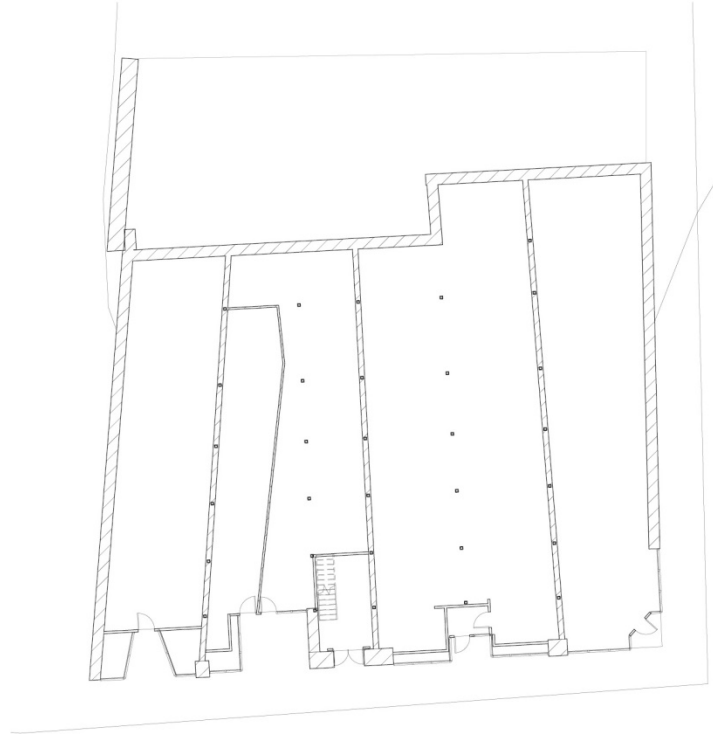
Existing Conditions First Floor Plan⁴³ (Image by author)
